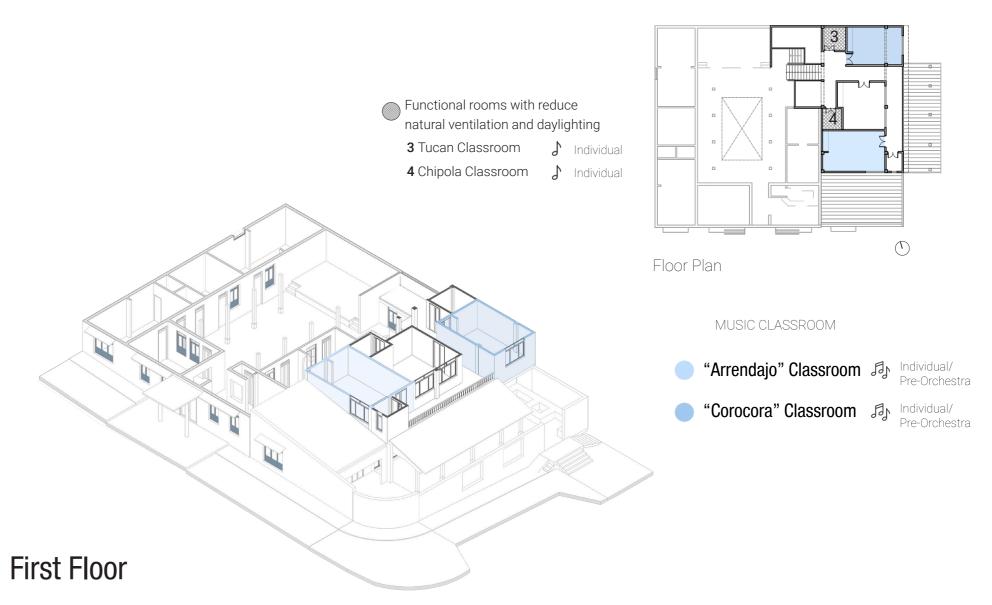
Axonometry and floor plan First floor selected rooms Source: Author's elaboration
